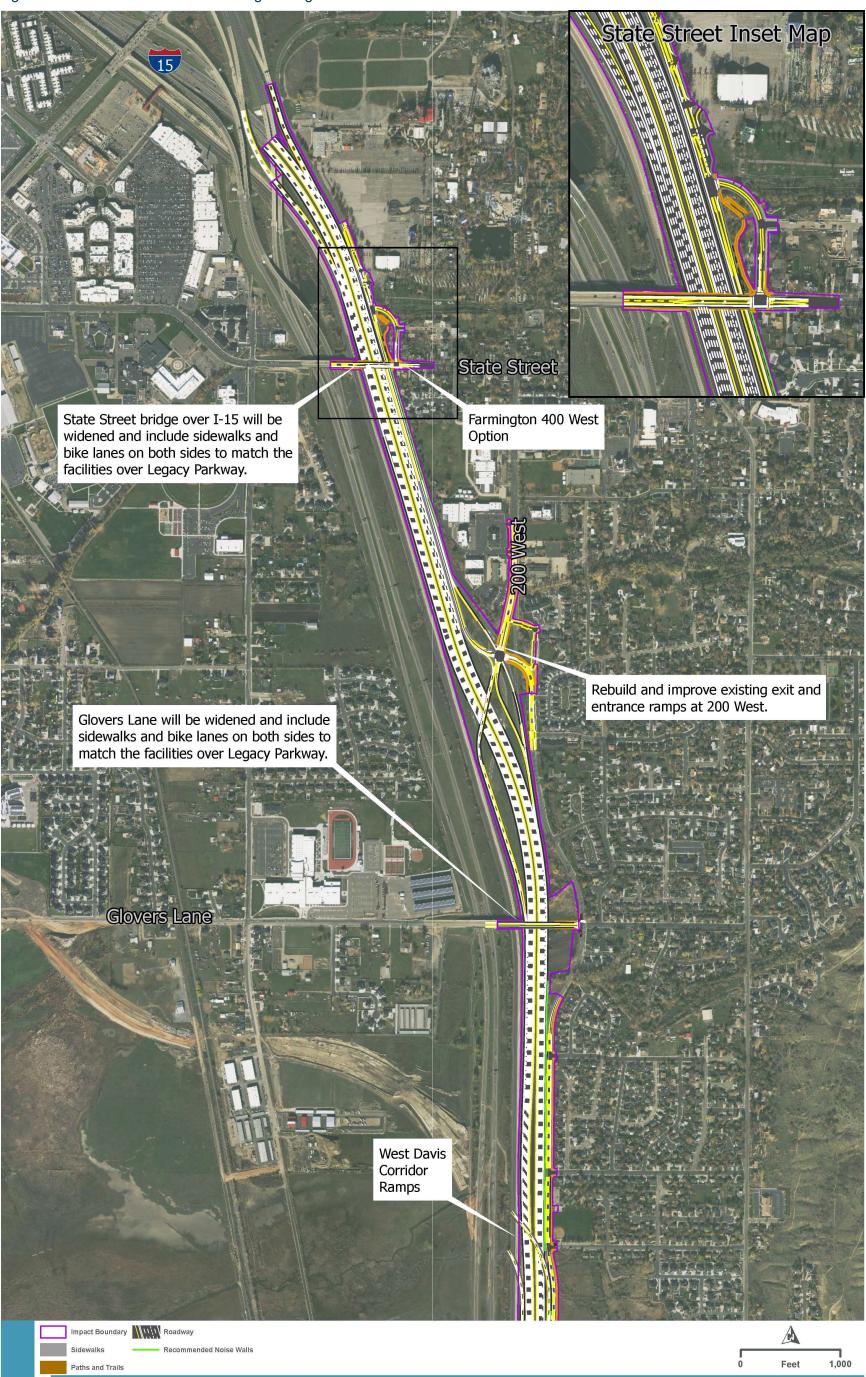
Farmington State Street/Frontage Road and 400 West/Frontage Road Options
